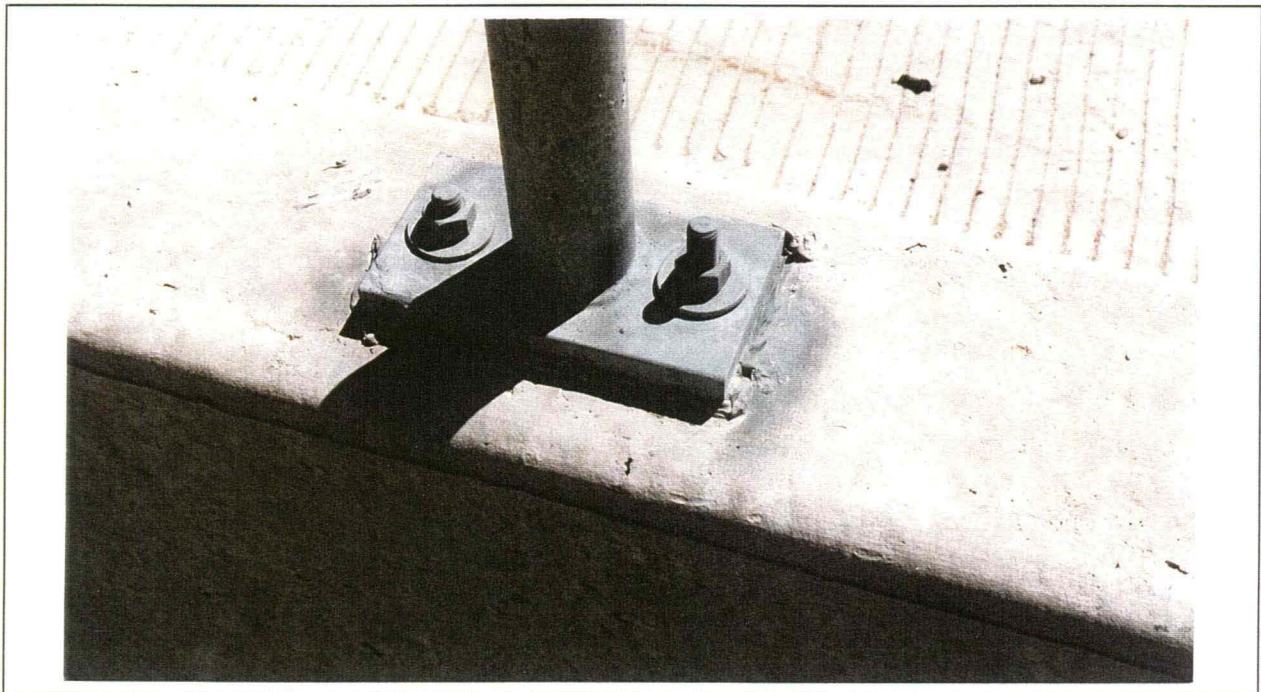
View of pedestrian rail at sidewalk showing inconsistent setting of mounting studs, haphazard application of caulking material and paint overspray.
